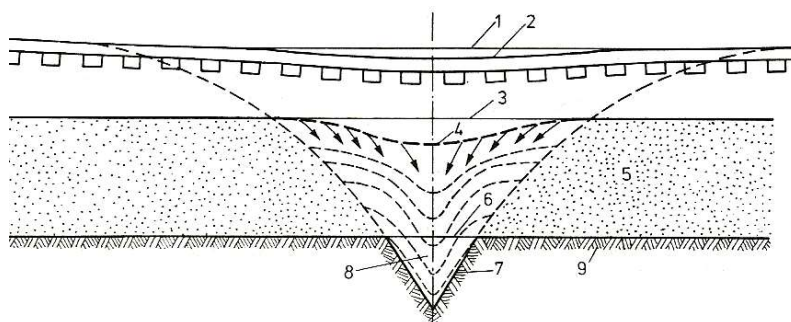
A fragment of the longitudinal section of a railway track with a shock absorbing layer, installed between the track ballast and the subsoil: 1 – rail head grade before deformation of the substrate, 2 – position of the rail head after deformation of the substrate, 3 – position of the ceiling cushioning before substrate deformation, 4 – position of the ceiling of the cushioning layer, after deformation of the substrate, 5 – shock absorbing layer, 6 – position of the cushioning layer 's bottom before substrate deformation, 7 – position of the base of the cushioning layer after deformation of the substrate, 8 – cave-in, 9 – ground surface exposed to mining damage
